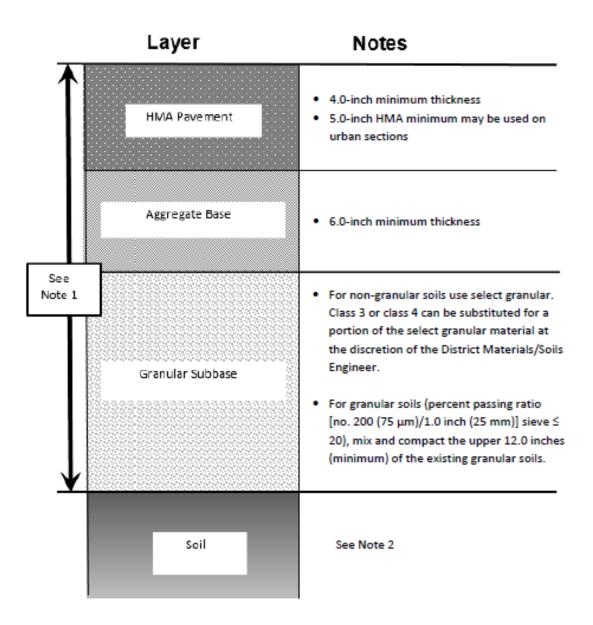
A Typical MnDOT Pavement Cross Section (after MnDOT, 2018b)
